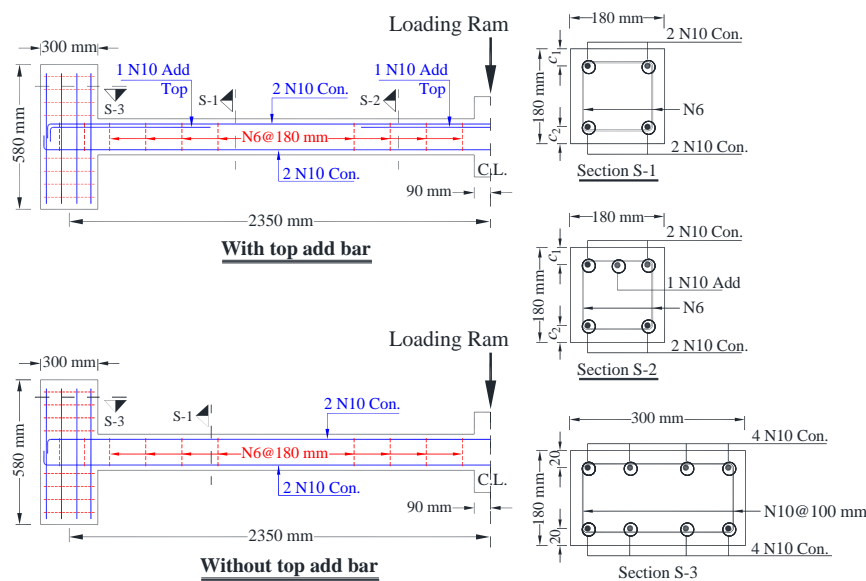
Outline of geometry, cross-section and reinforcing details for RC beam sub-assemblages.
